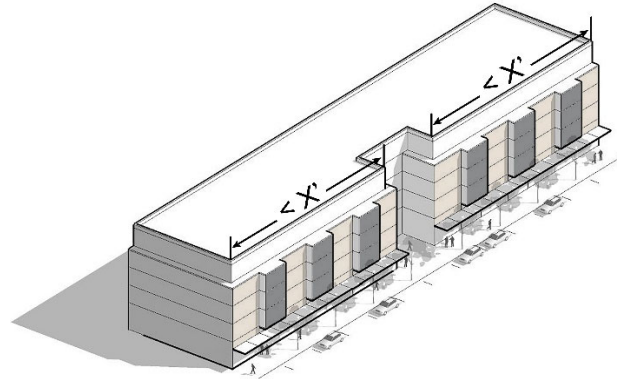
C.080.510(3)Illustrating maximum façade length standards and good and bad examples.
